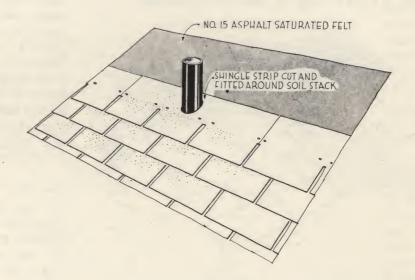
Roofing is first applied up to the pipe and fitted around it.
